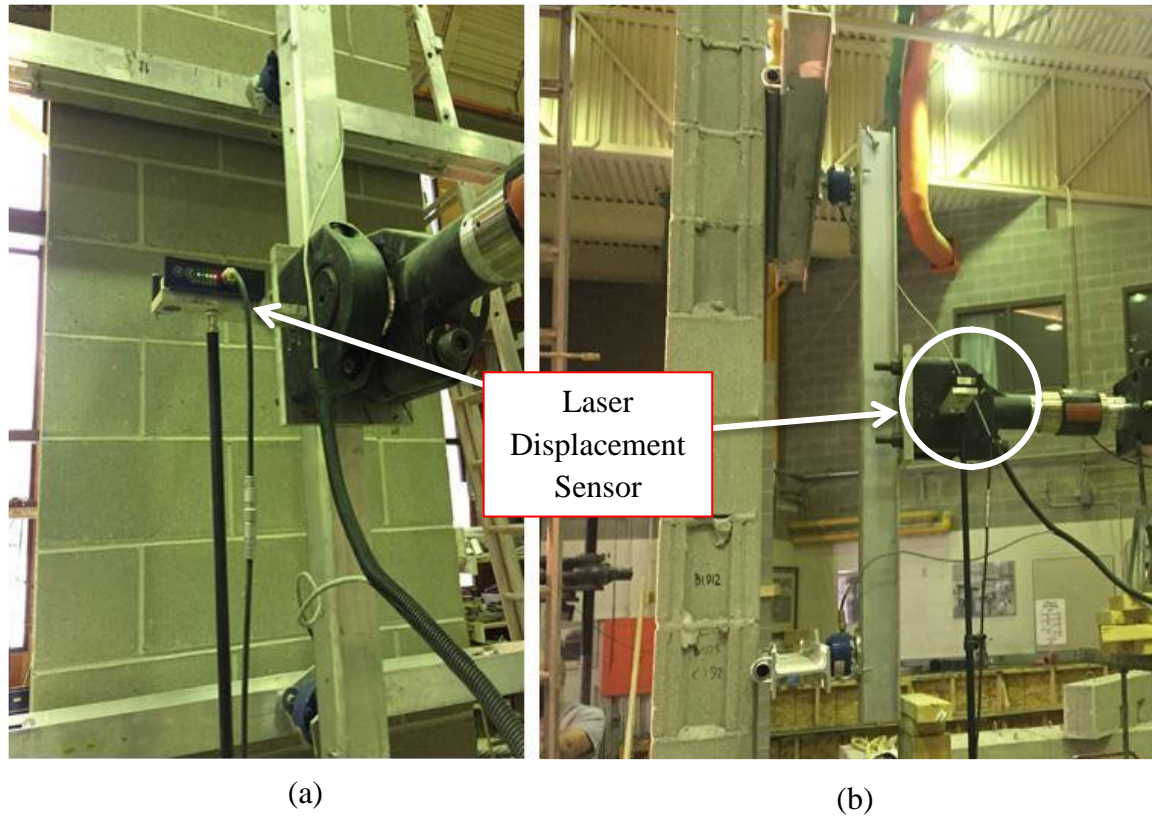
optoNCDT Laser Displacement Sensor in Test Setup: (a) Front View, and (b) Side View
